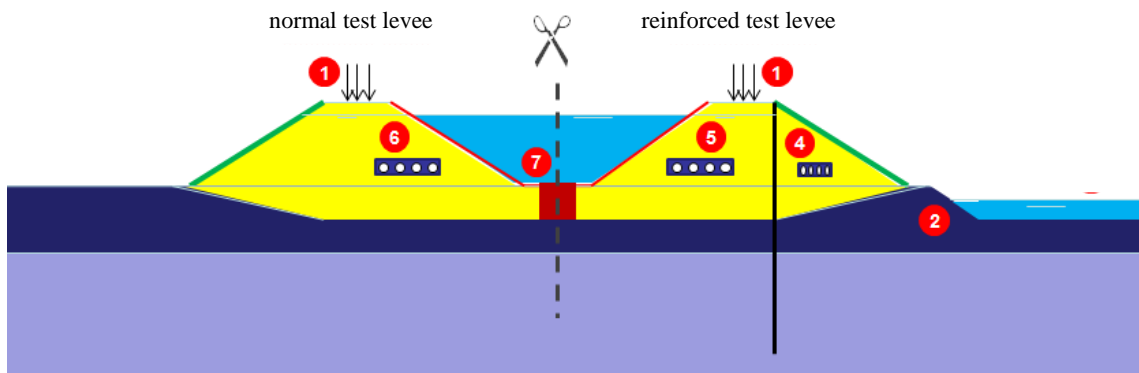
Cross section test levee without (left) and with (right) sheet pile wall with load (1), excavation (2), infiltration/drainage utilities (4, 5 and 6) en clay cut off wall (7)
